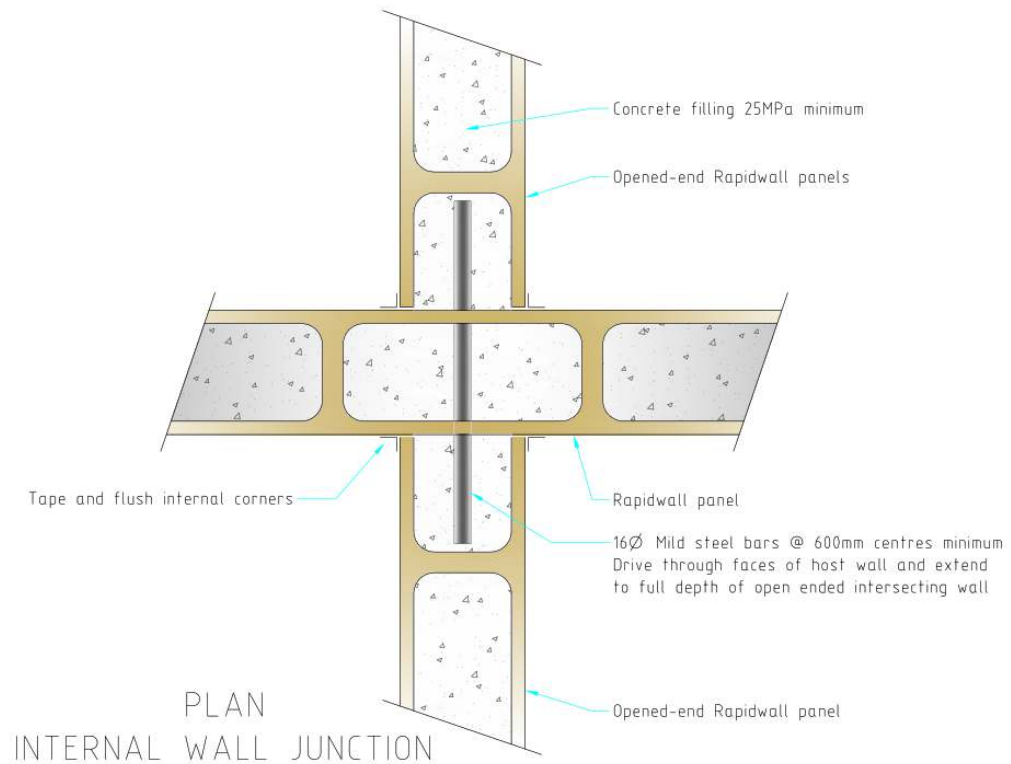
Internal Intersecting walls concrete filled or Insulated
